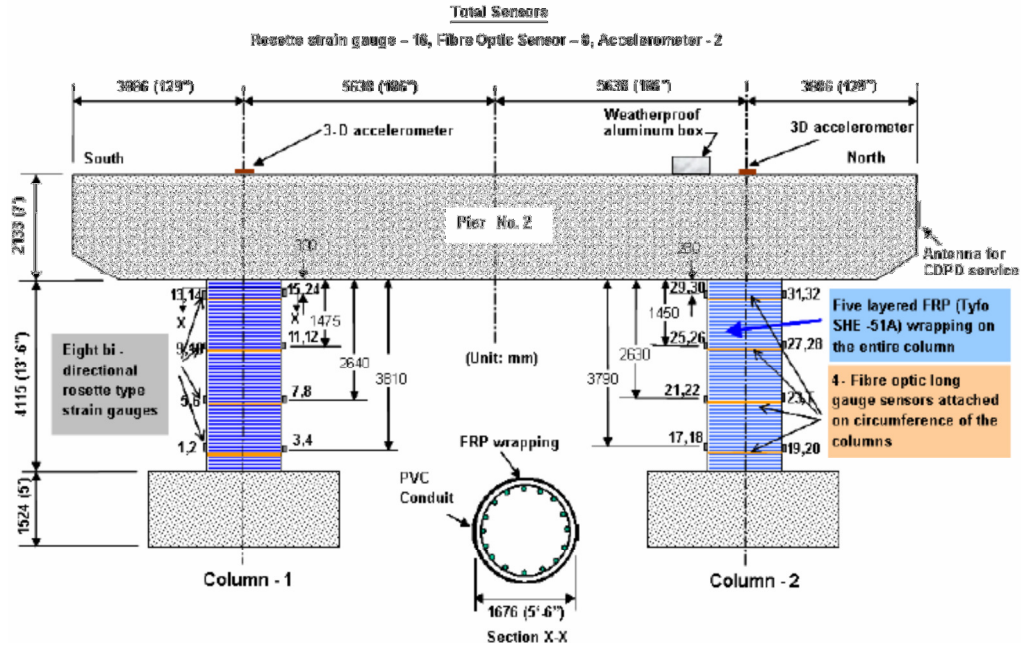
Sensor locations on Pier-2 columns of the Portage Creek Bridge (Huffman et al. 2006)
